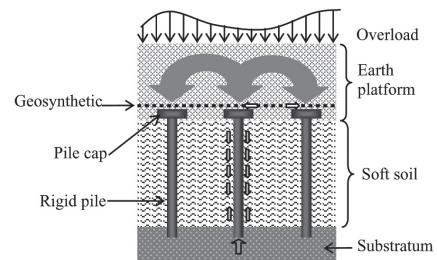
Schematic of geosynthetic reinforced piled foundation.
